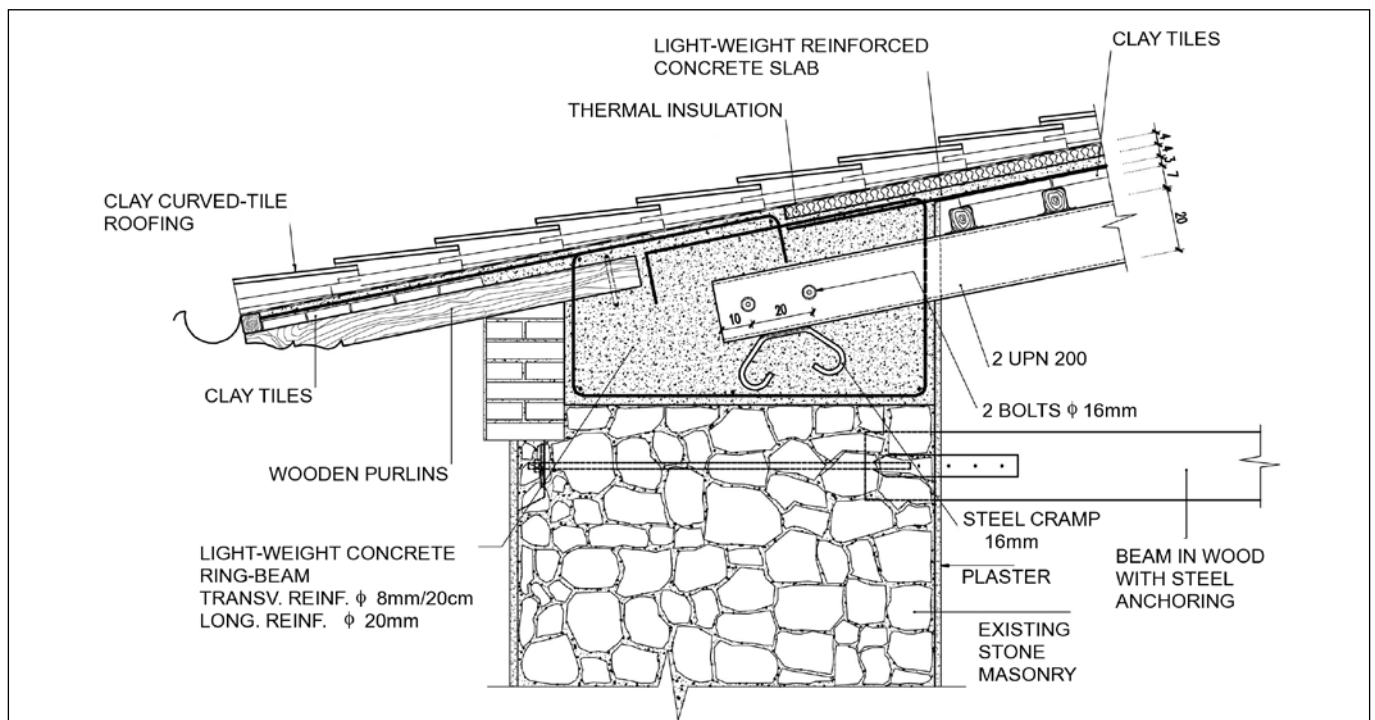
Details of a reinforced light-weight concrete ring beam at roof level and wall-to-floor anchoring (Mariani, 2006)
